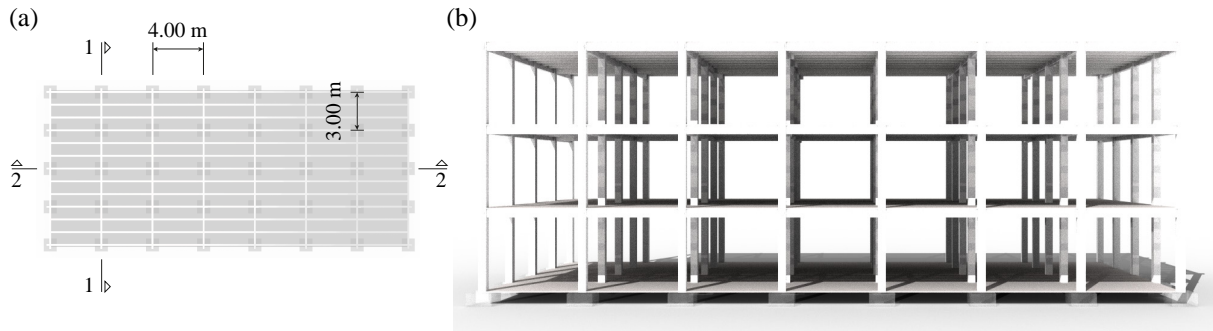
Case study – Primary structural system: (a) ground plan, (b) schematic view
